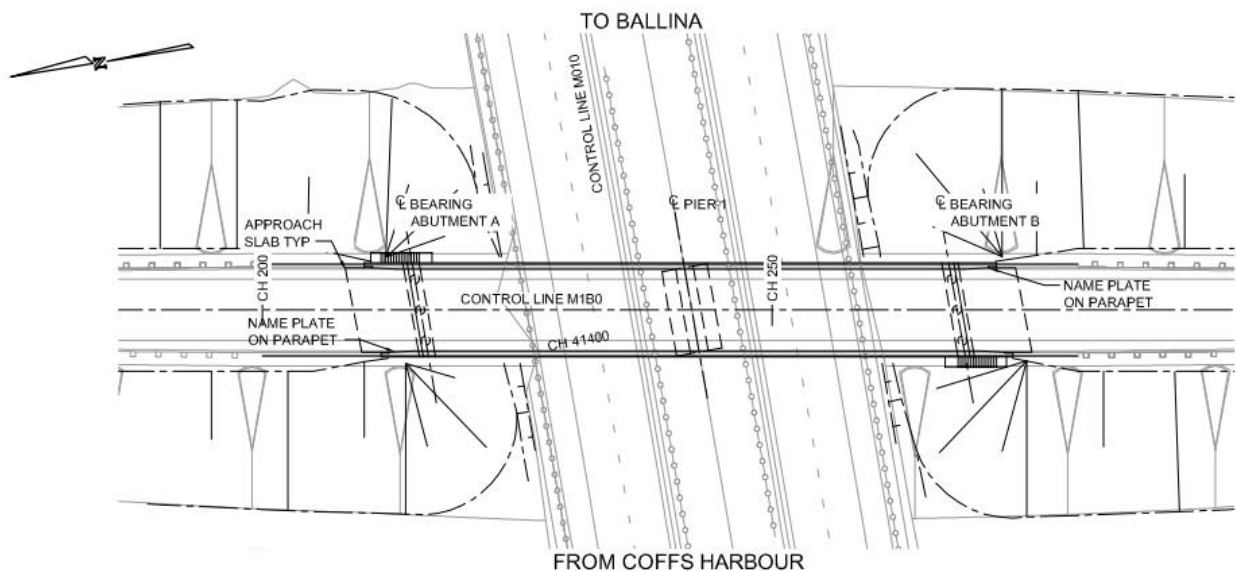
Proposed Avenue Road overpass of Woolgoola to Ballina Pacific Highway upgrade
